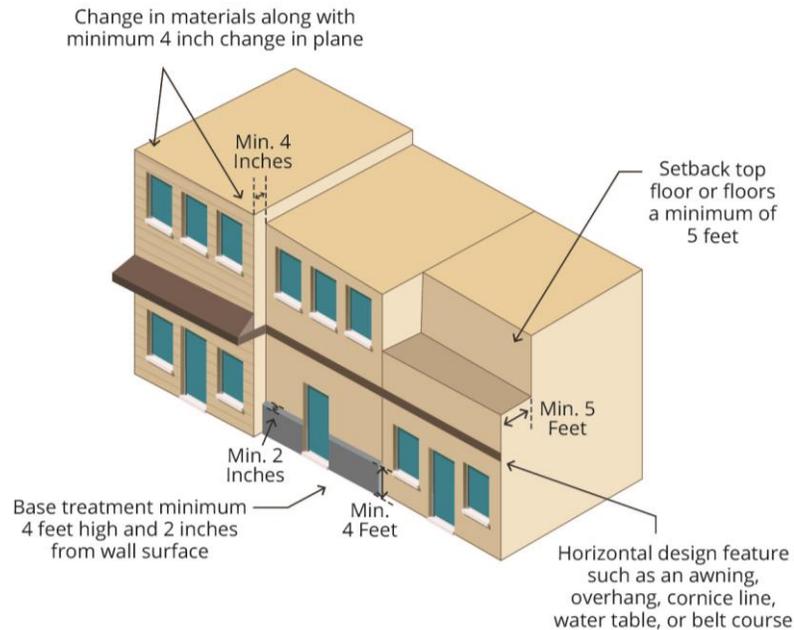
E MIXED USE BUILDINGS, VERTICAL ARTICULATION
